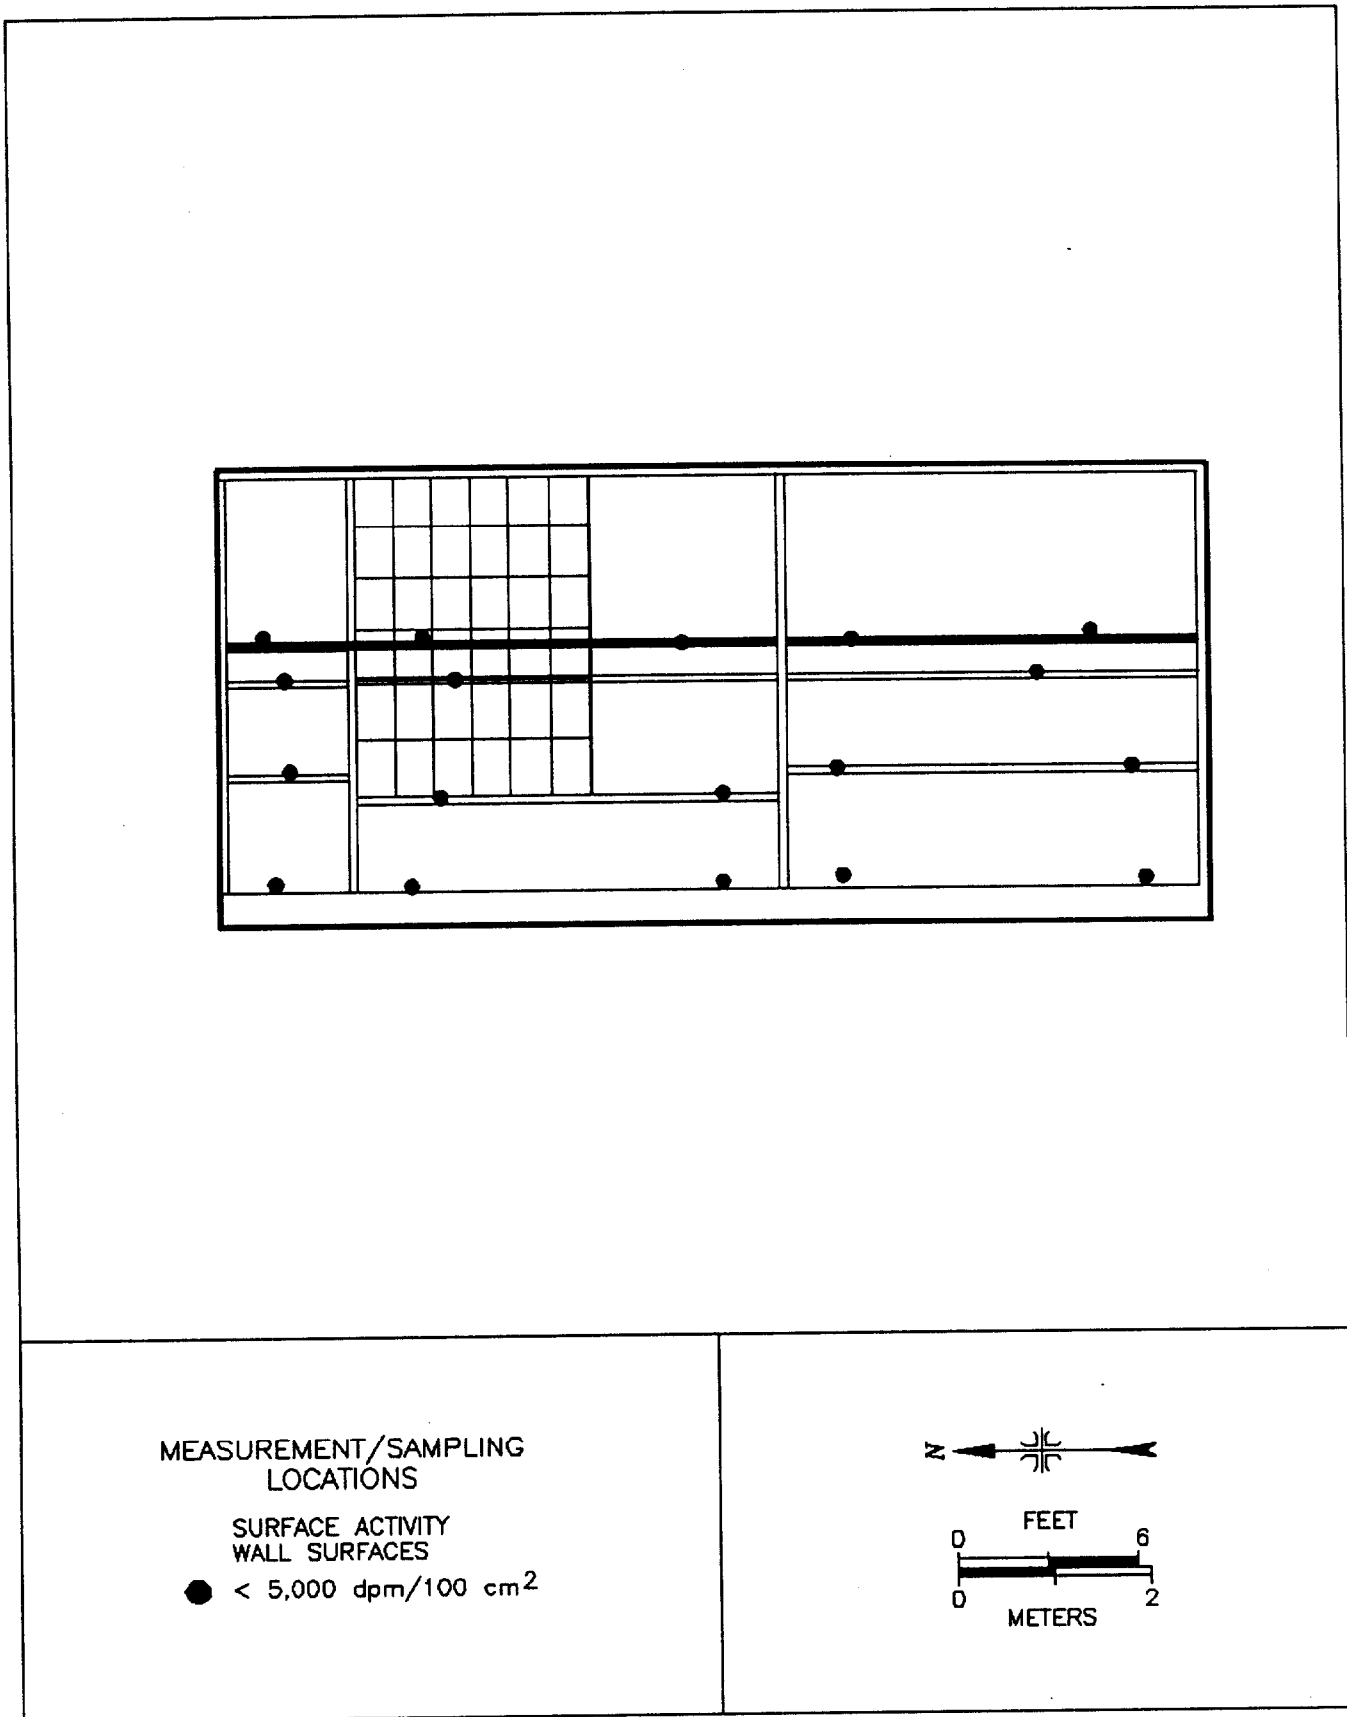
Building 8, Room B, East Wall – Measurement and Sampling Locations
